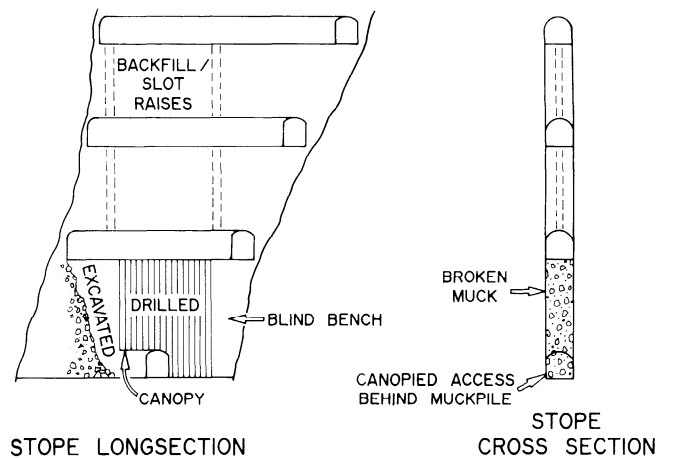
Overhand/underhand bench, general arrangement, Cannon mine.
